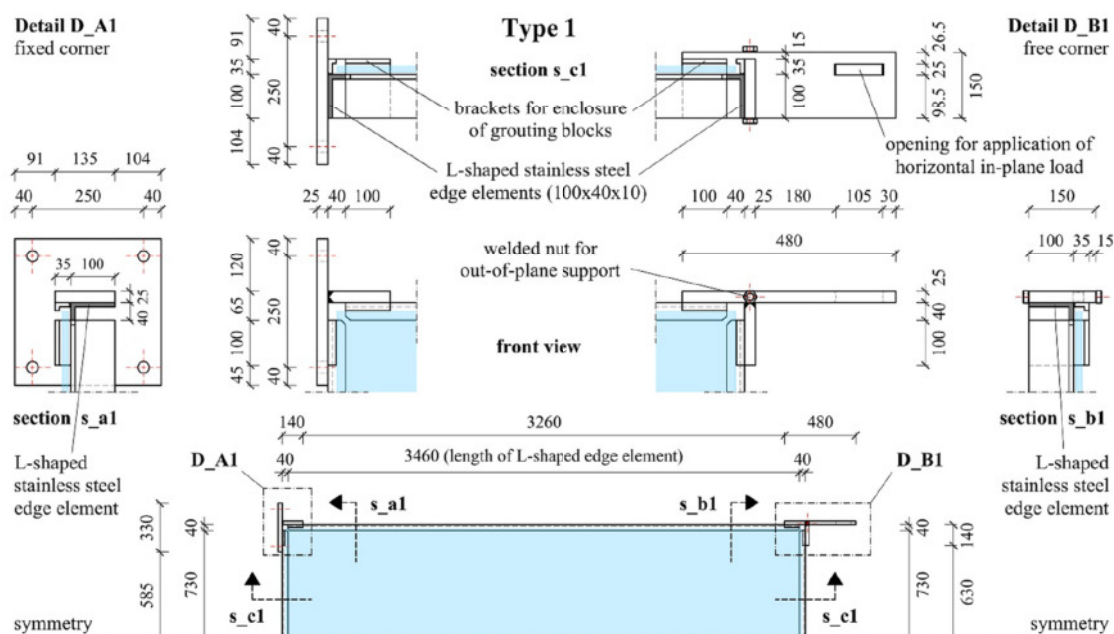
Dimensions of the metal framing for the large-scale test specimen of Type 1 in [mm].
